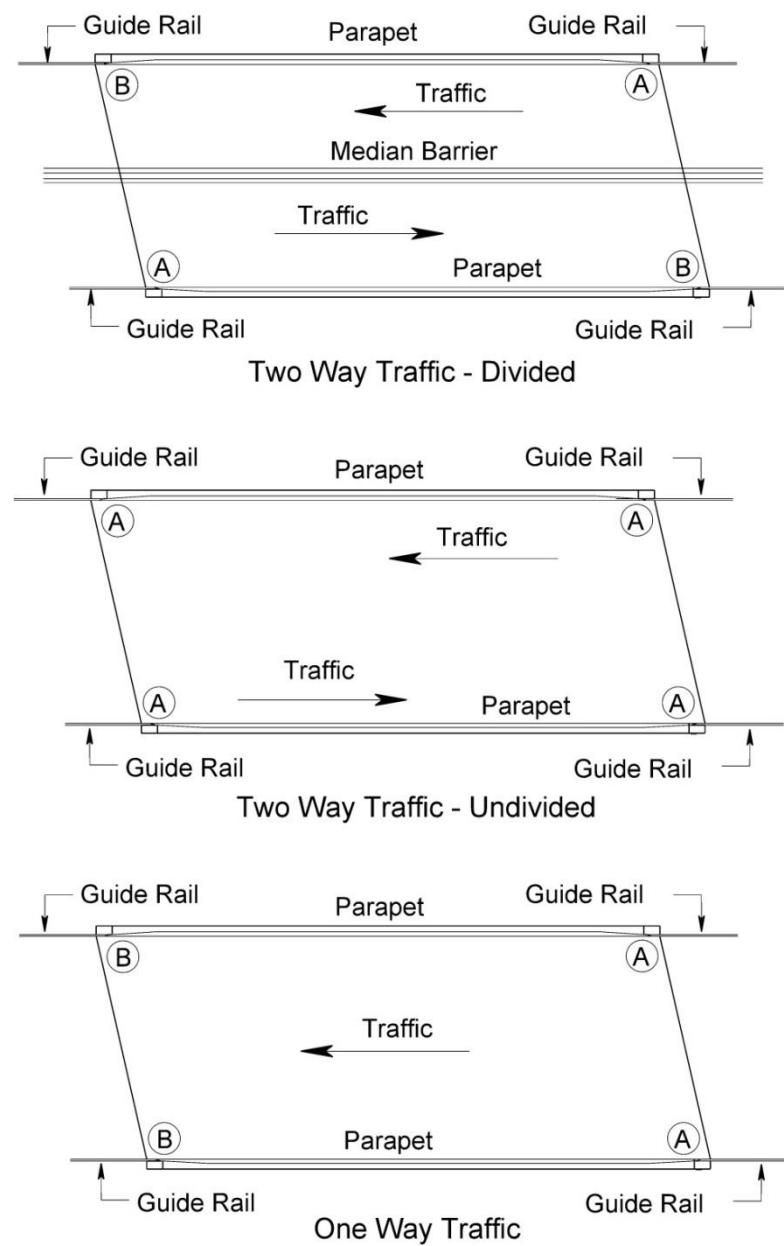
W-Beam Type A and Type B Bridge Attachments
